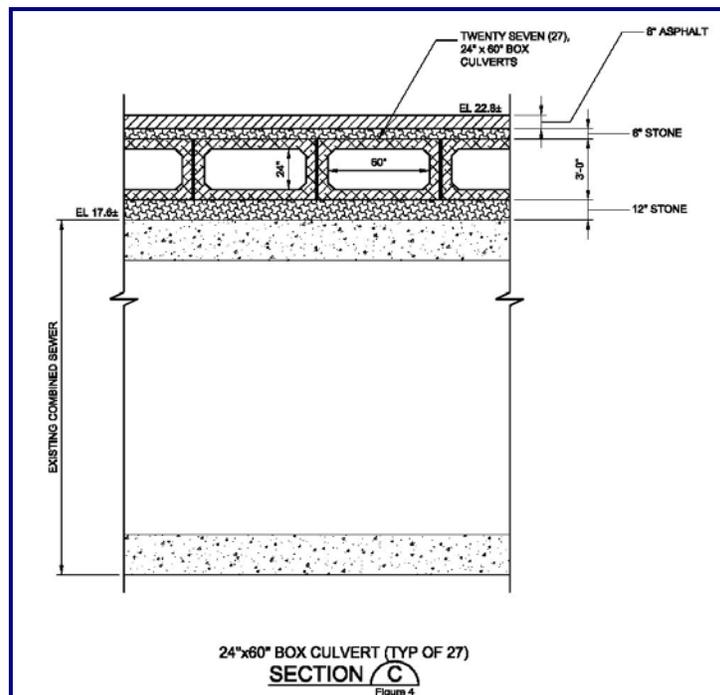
Section view through the existing combined sewer and proposed box culverts.
